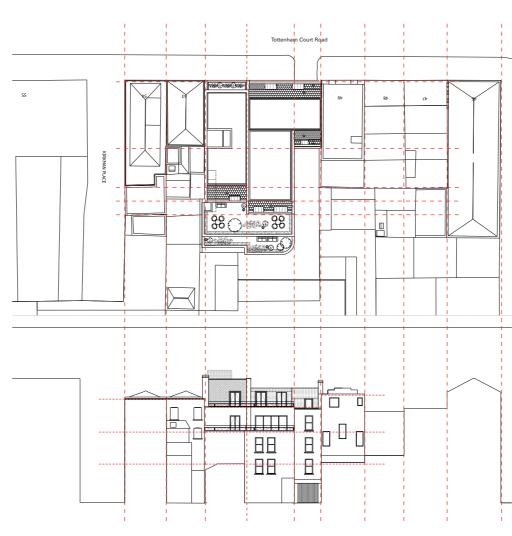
Proposed Roof Plan and Rear Elevation - Urban grain clearly re-organized to the desired plot widths and aligning floor levels along street
